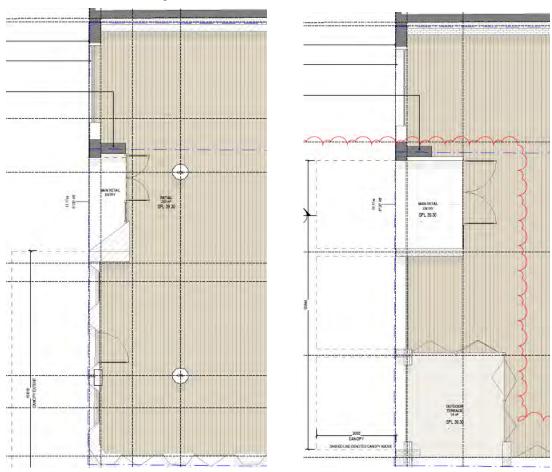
Original (left) and revised (right) Ground Level Plan extract showing the Lygon Street interface. From Drawing A1.01
